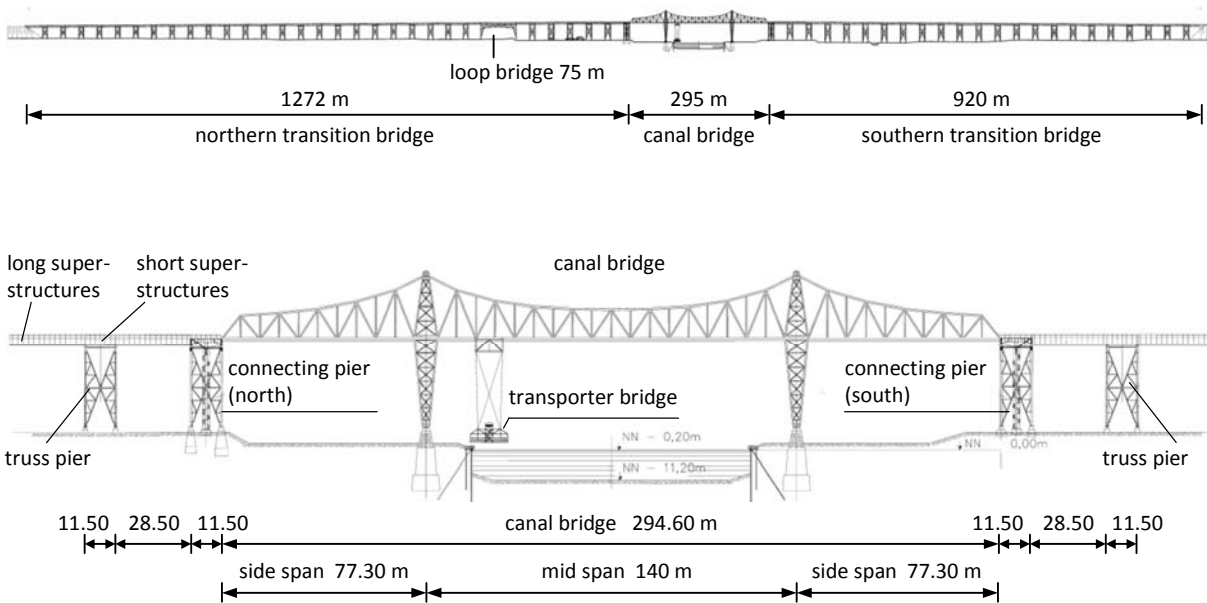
General view of the Rendsburg High Bridge and detail of the canal bridge
